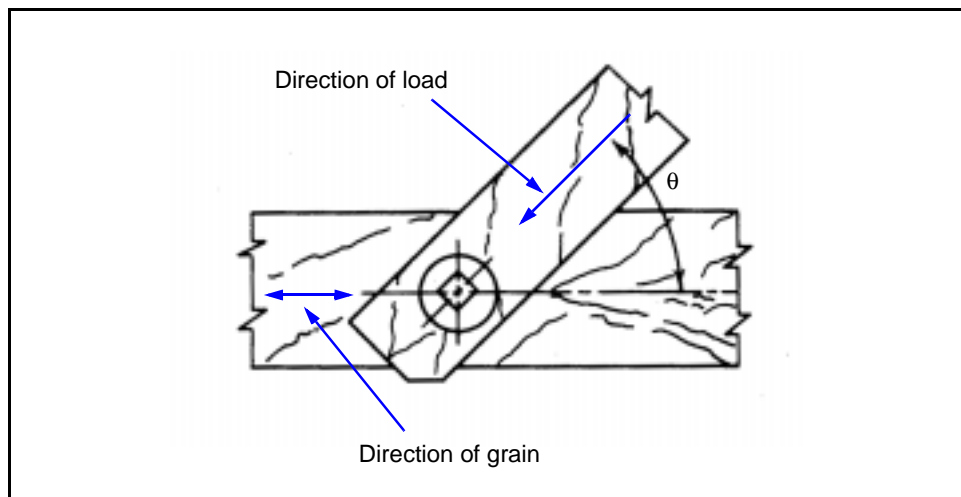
Timber Connections with the Load Applied at an Angle to the Grain
